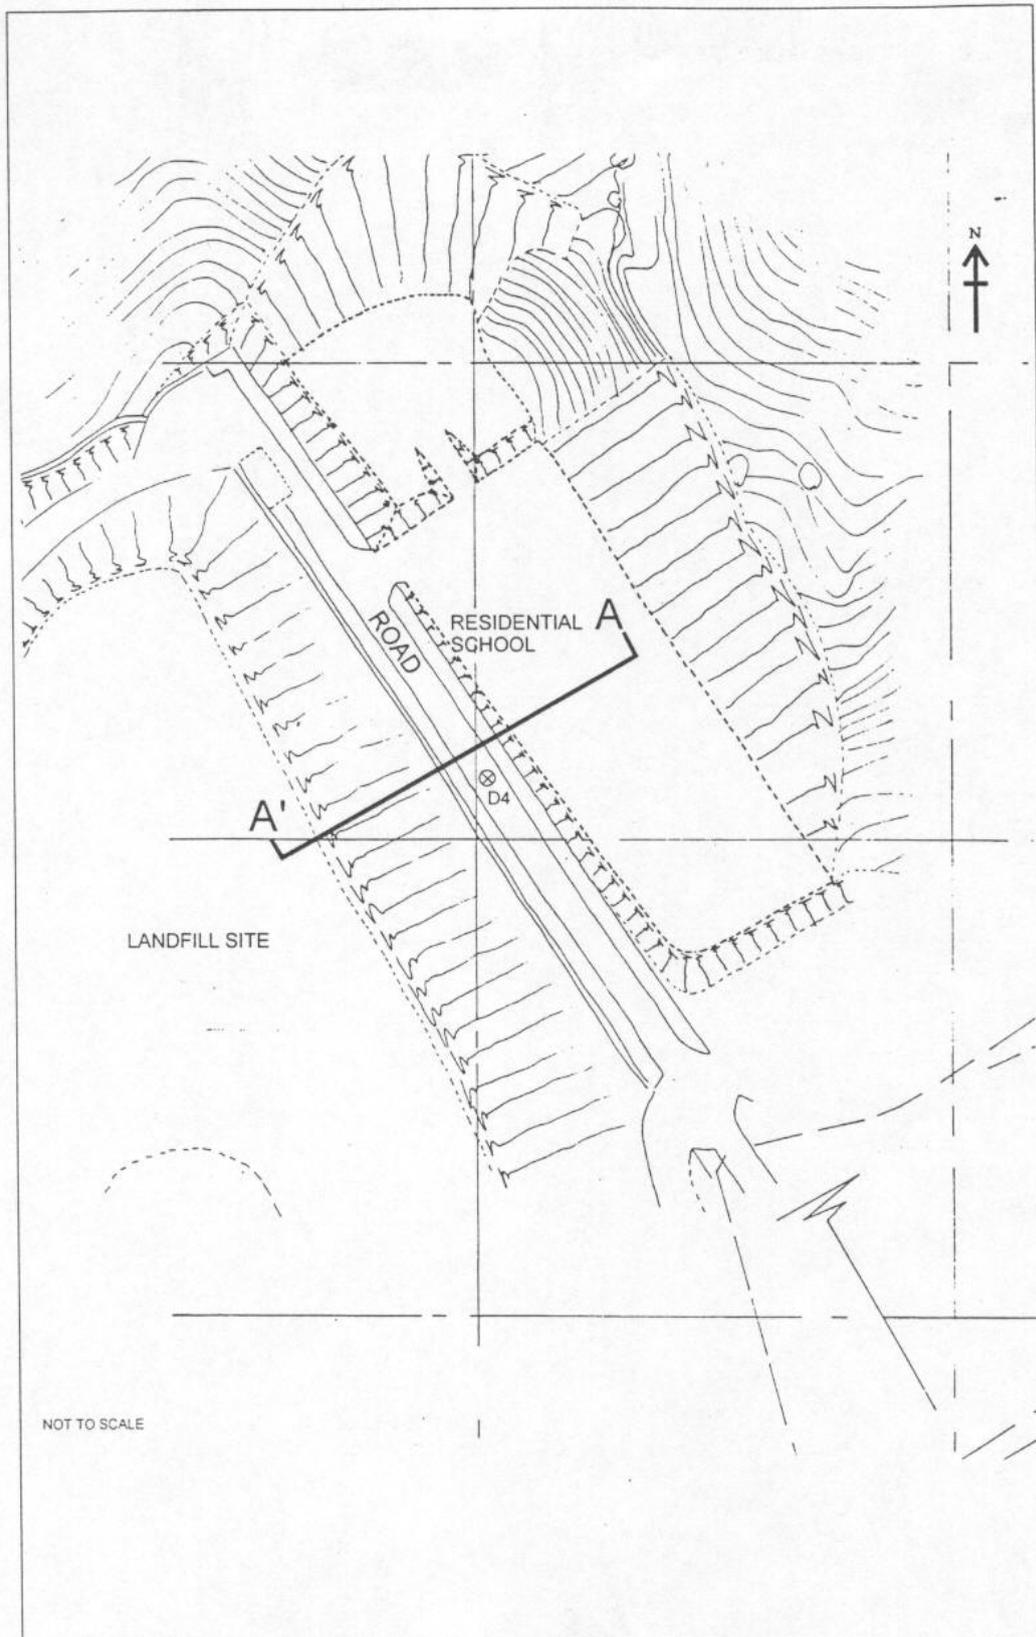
PLAN SHOWING RELATIVE LOCATION OF LANDFILL SITE AND PROPOSED RESIDENTIAL SCHOOL DEVELOPMENT
